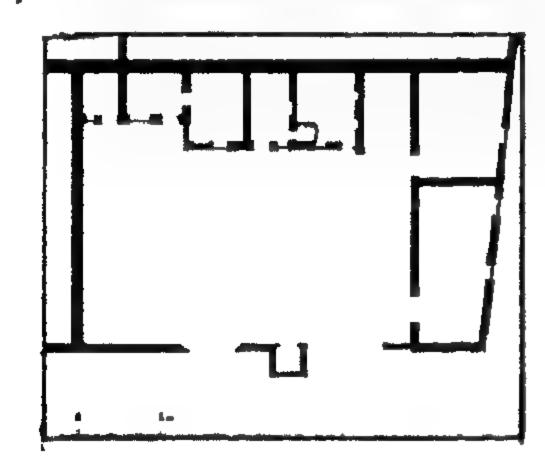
Plan of a multicellular house with a "simple" plan (after Aurenche 1981 a).
